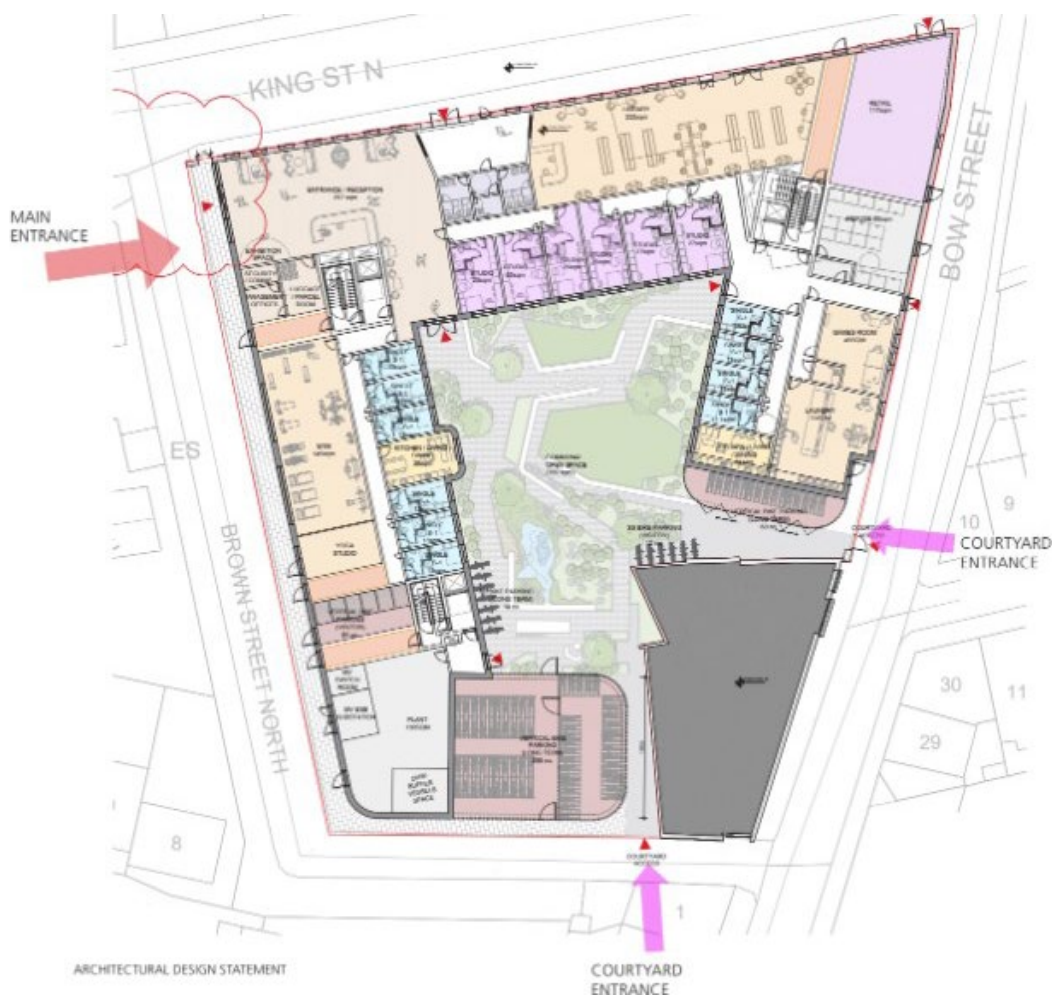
Proposed scheme design – scheme layout (Source: Architectural Design Statement, MOLA Architecture)
